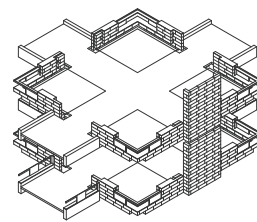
Fixed parts and changeable parts in isometric view (J.Lim, 2017)
